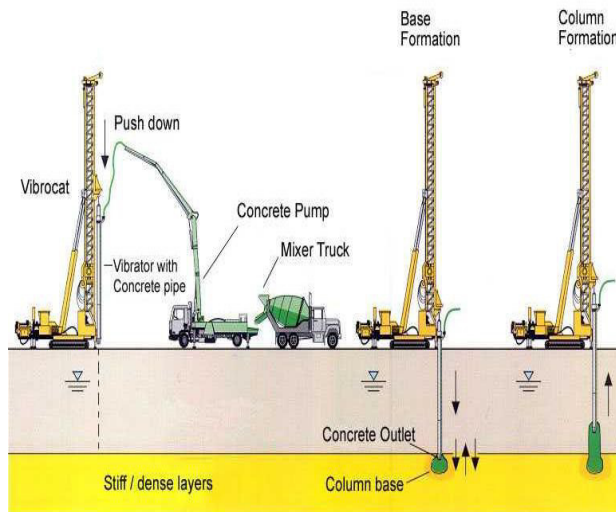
Schematic showing the installation of Vibro Concrete Columns (VCC)
